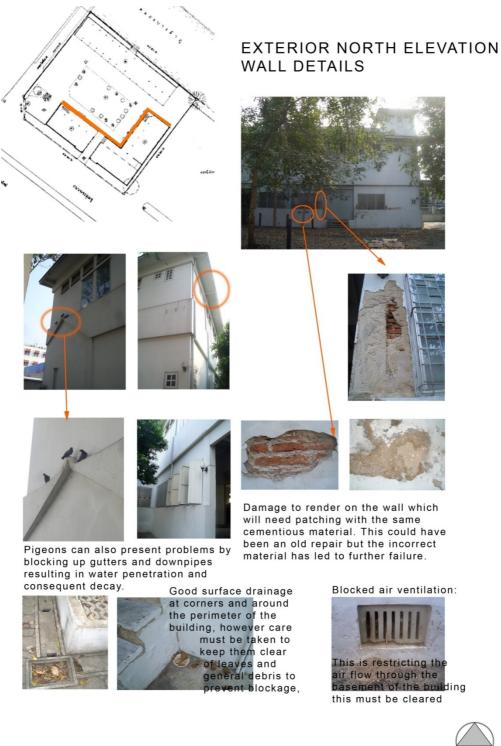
Kuru Sapha - Exterior north elevation wall details (author)
